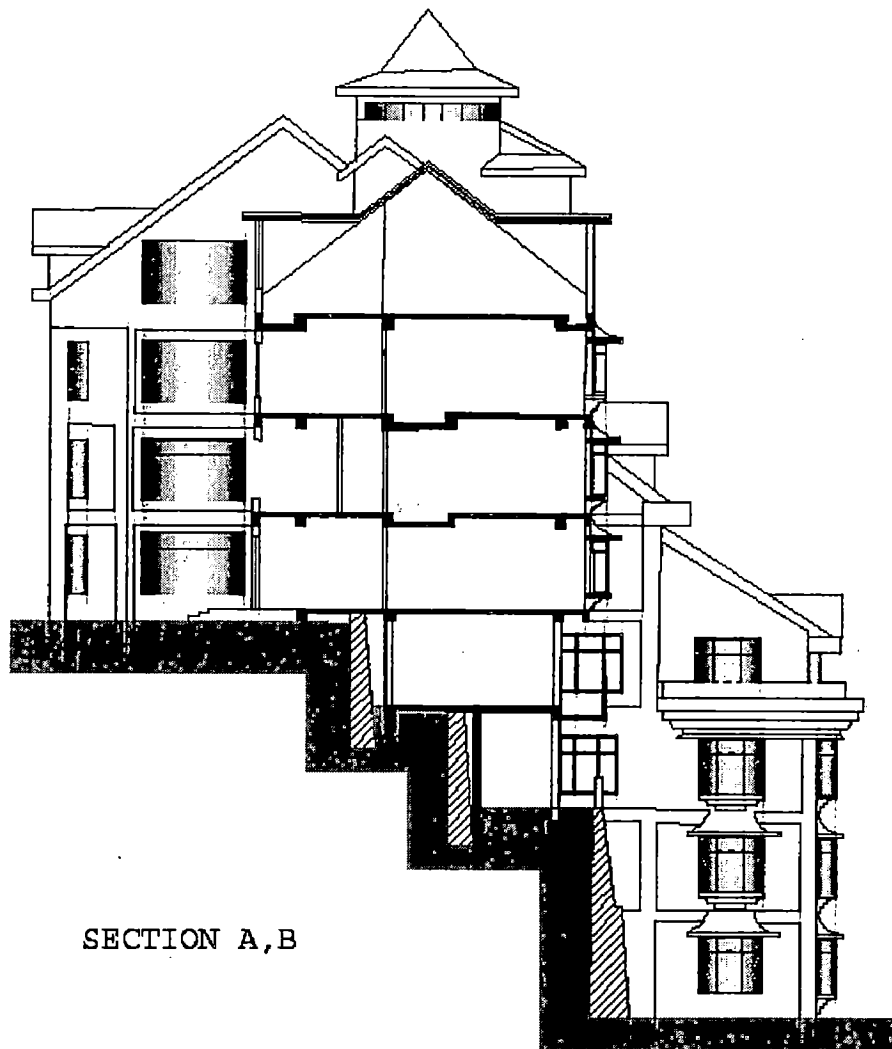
Transverse section of Nirman Bhawan, Shimla
